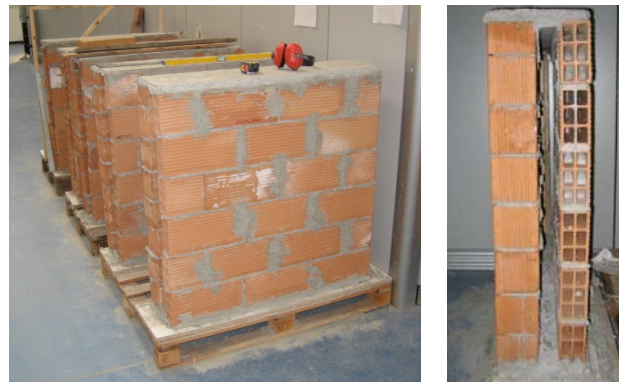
double panel walls, specimens ready to be tested (left), side view of double panel wall (right)
